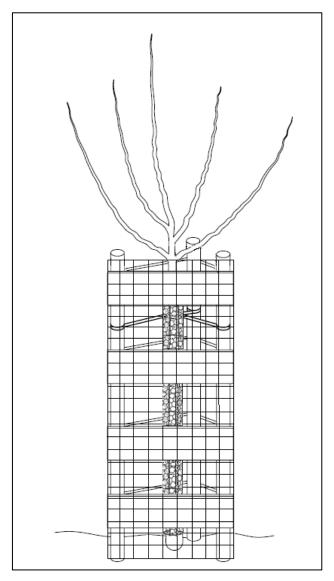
Planting with three-point anchoring and reinforced outer protective casing – design example (see 5. 7. 10)
